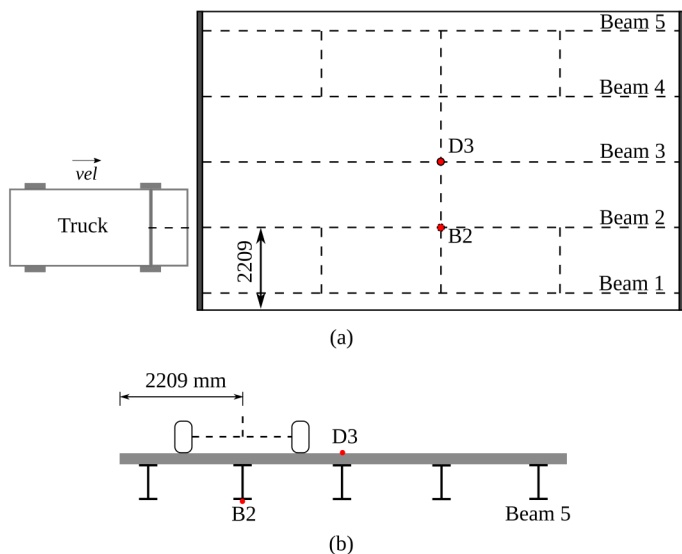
Truck alignment: (a) Plan view, and (b) Front view
